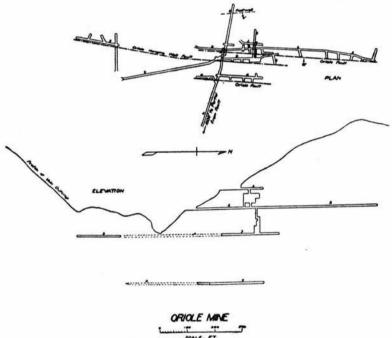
Plan and elevation of the main workings of the Oriole mine, Galice district, Oregon.
